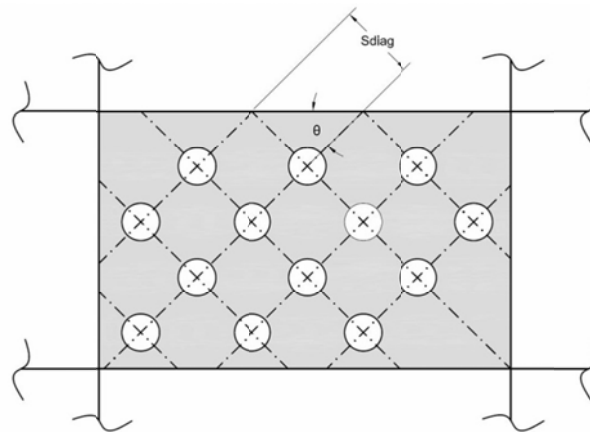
Special Perforated Steel Plate Shear Walls (AISC 2010)
